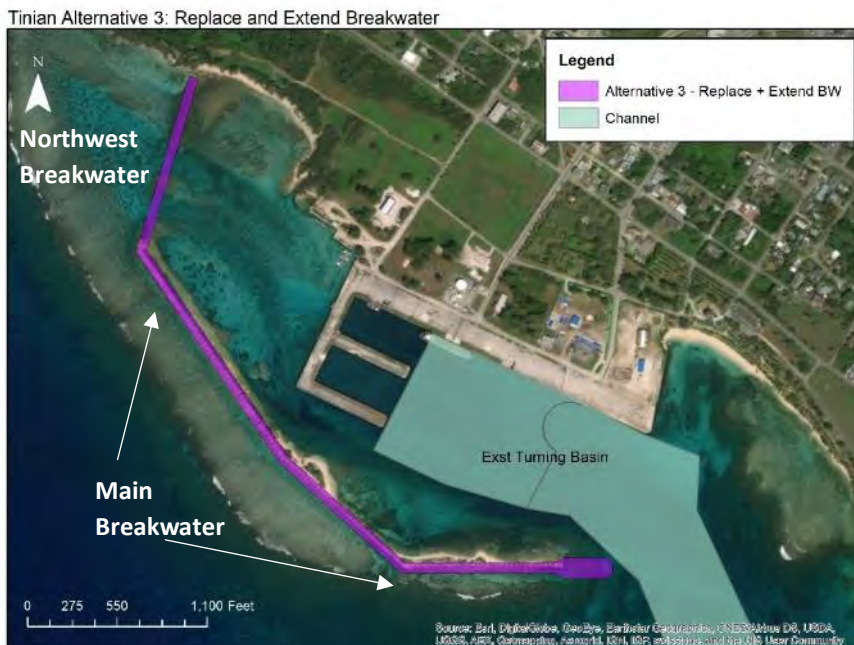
Conceptual Layout of Replace and Extend Existing Breakwater
